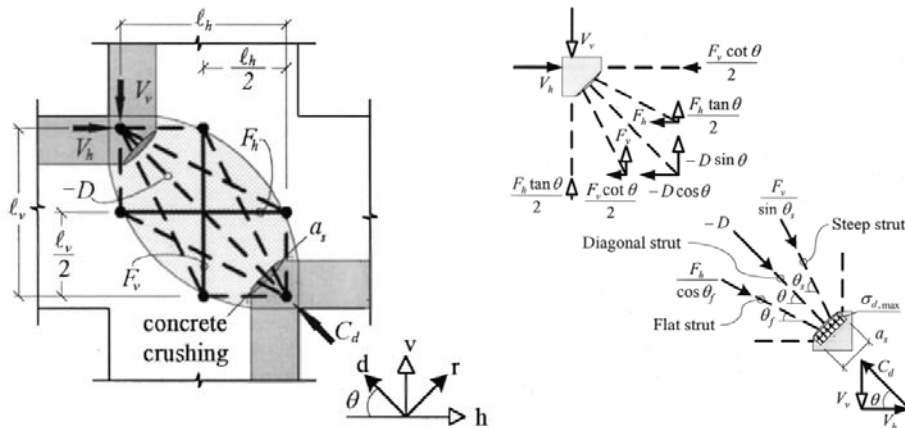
Hwang & Lee's strut-and-tie modelling of interior joint (Hwang & Lee, 2002).
